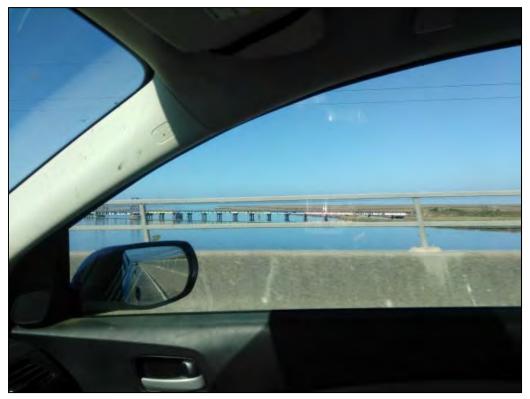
(VAU 2, KOP 2). View of Eureka Slough NCRA railroad bridge from Highway 101 south. View looking north.
